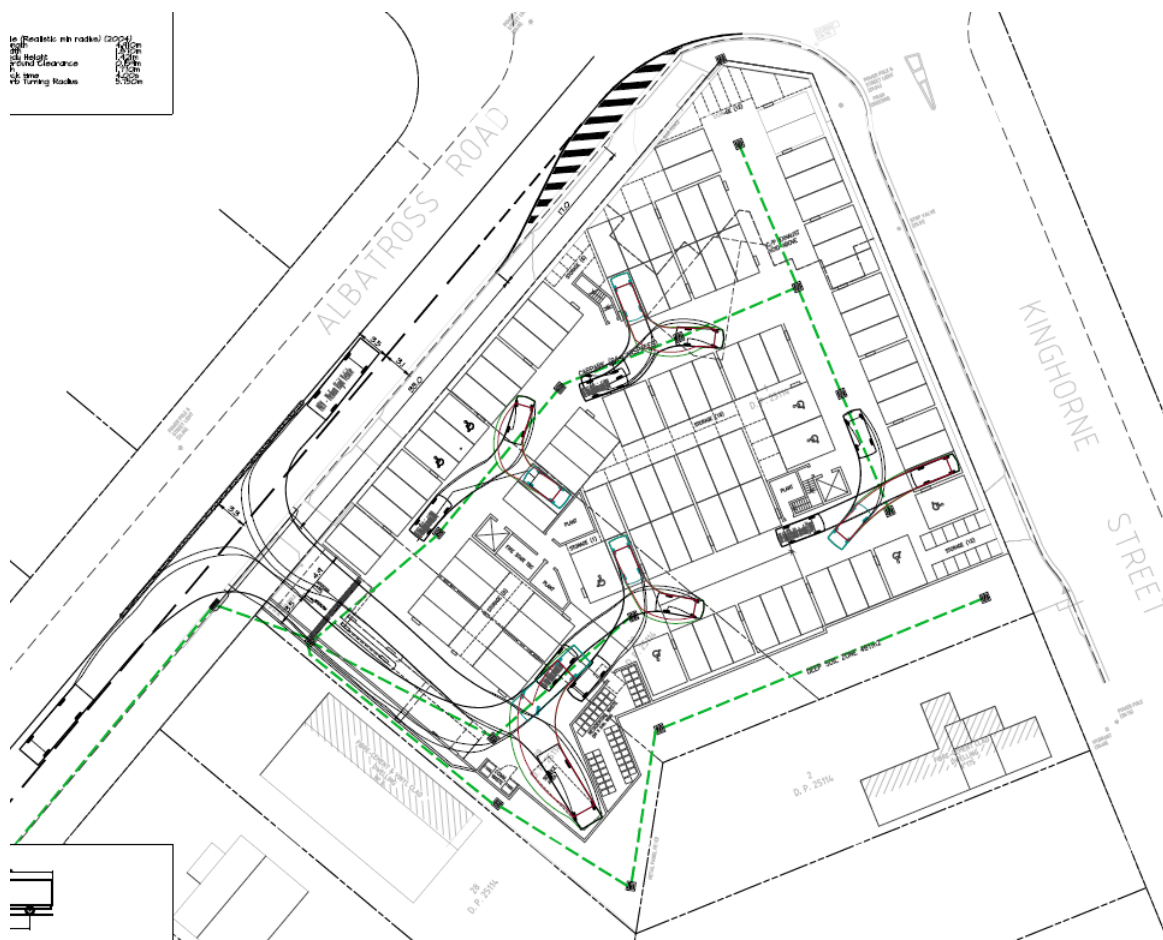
Extract of engineering design plan indicating the slip-lane and entry design to the development. The design includes a central median on Albatross Road to limit vehicle movements to a left in and left out movement.
